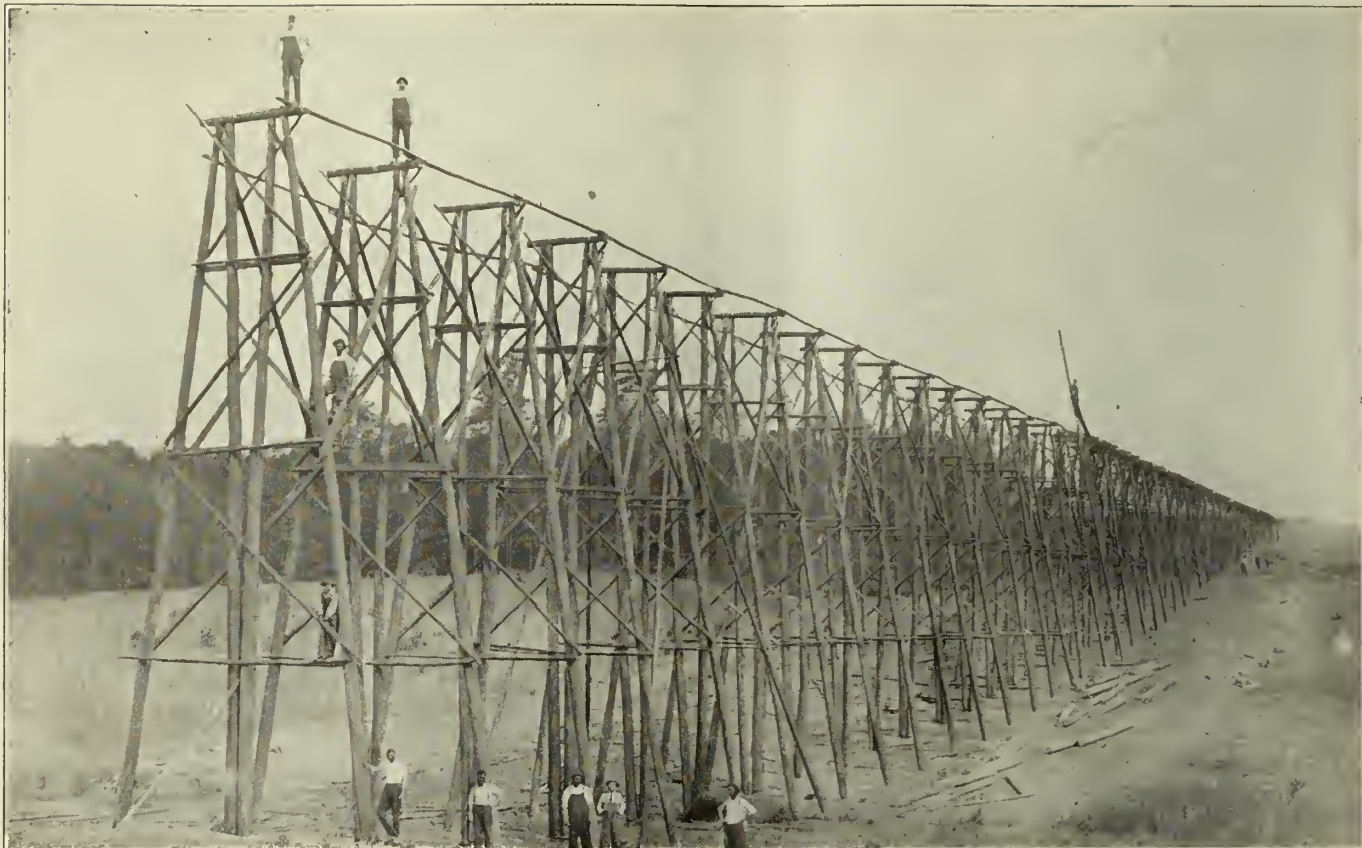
Typical Temporary Trestle Used in Making Heavy Fills, Louisville & Nashville Revision for Grade Reduction.
